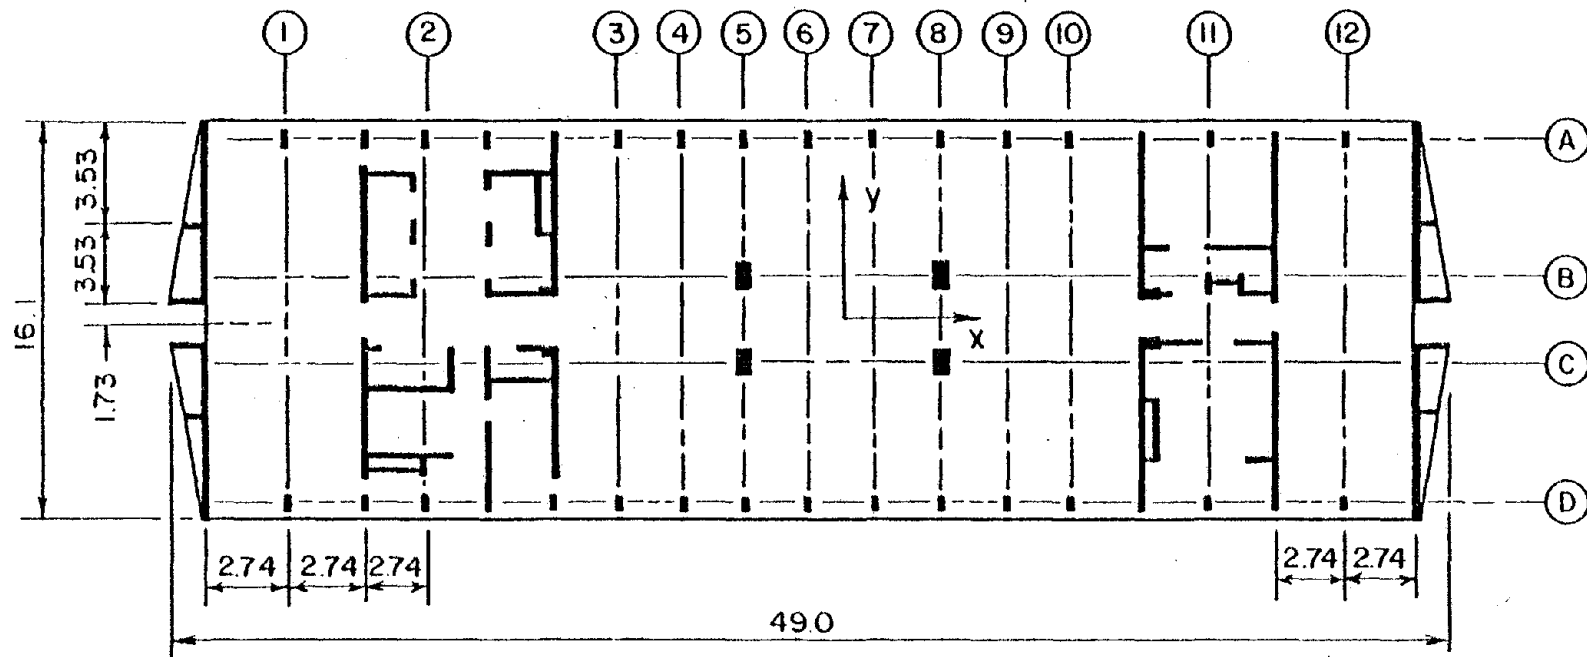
Typical Plan View of the Civic Center (All Dimensions in Meters).
